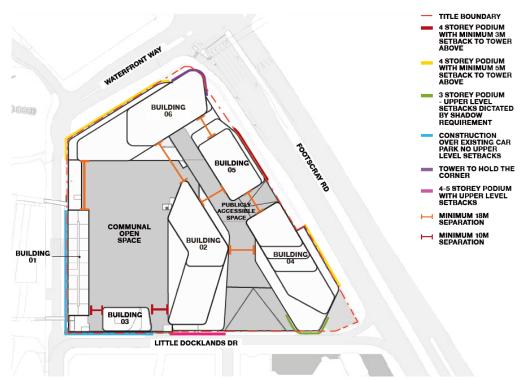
Concept Plan 7 - podium heights, tower setbacks and separation
